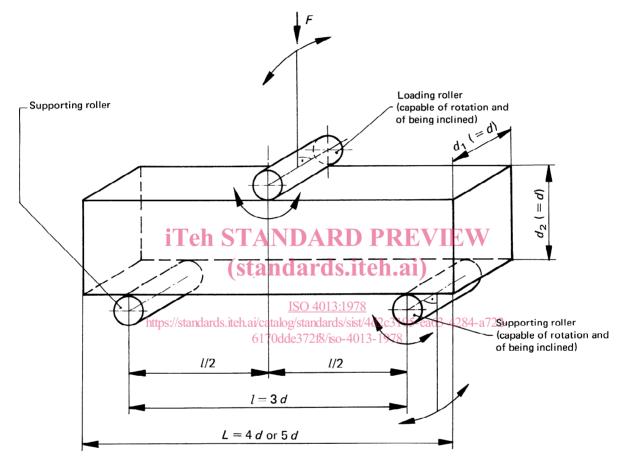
Arrangement of loading of test piece (centre-point loading)
